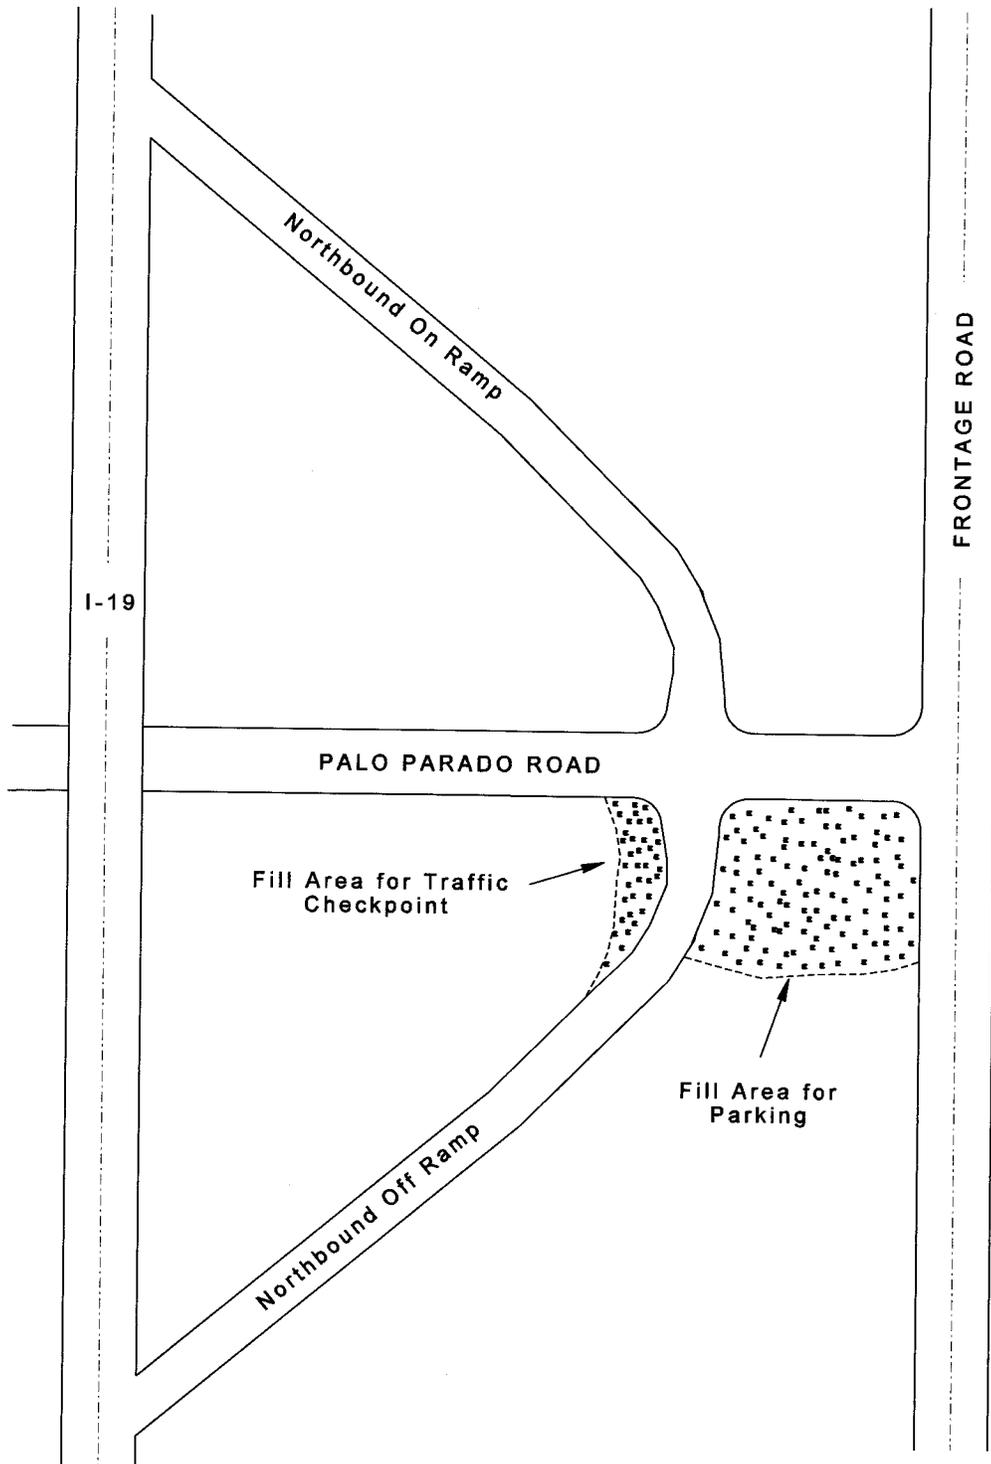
Sketch Map of Construction Plan for Proposed Traffic Checkpoint
